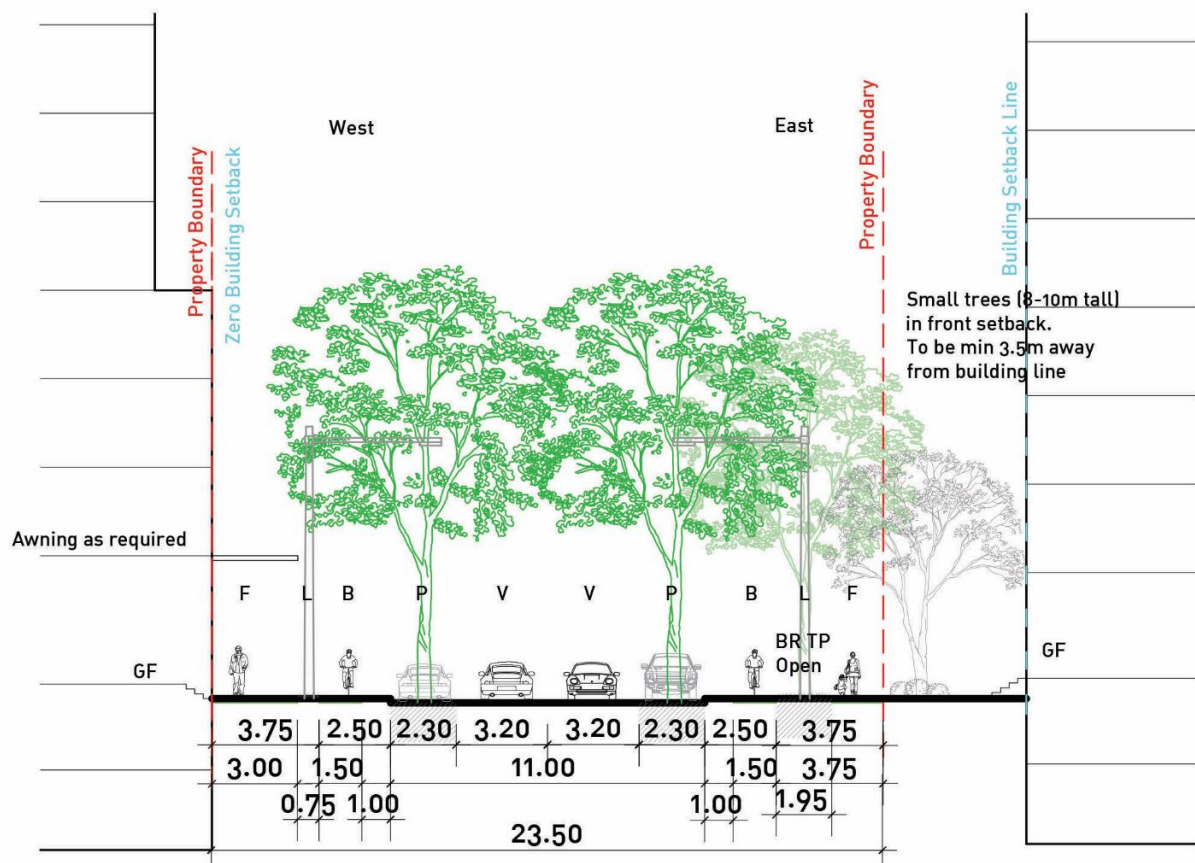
Type 2C Main Road with Cycle Tracks Town Centre Interface (NSR 3)
